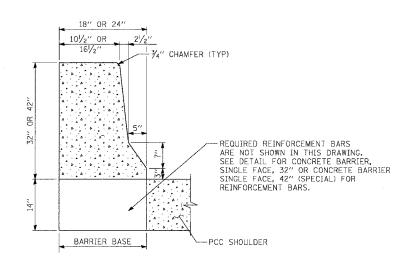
DETAIL OF "CONCRETE BARRIER TRANSITION" FOR SINGLE FACE BARRIER WALL
